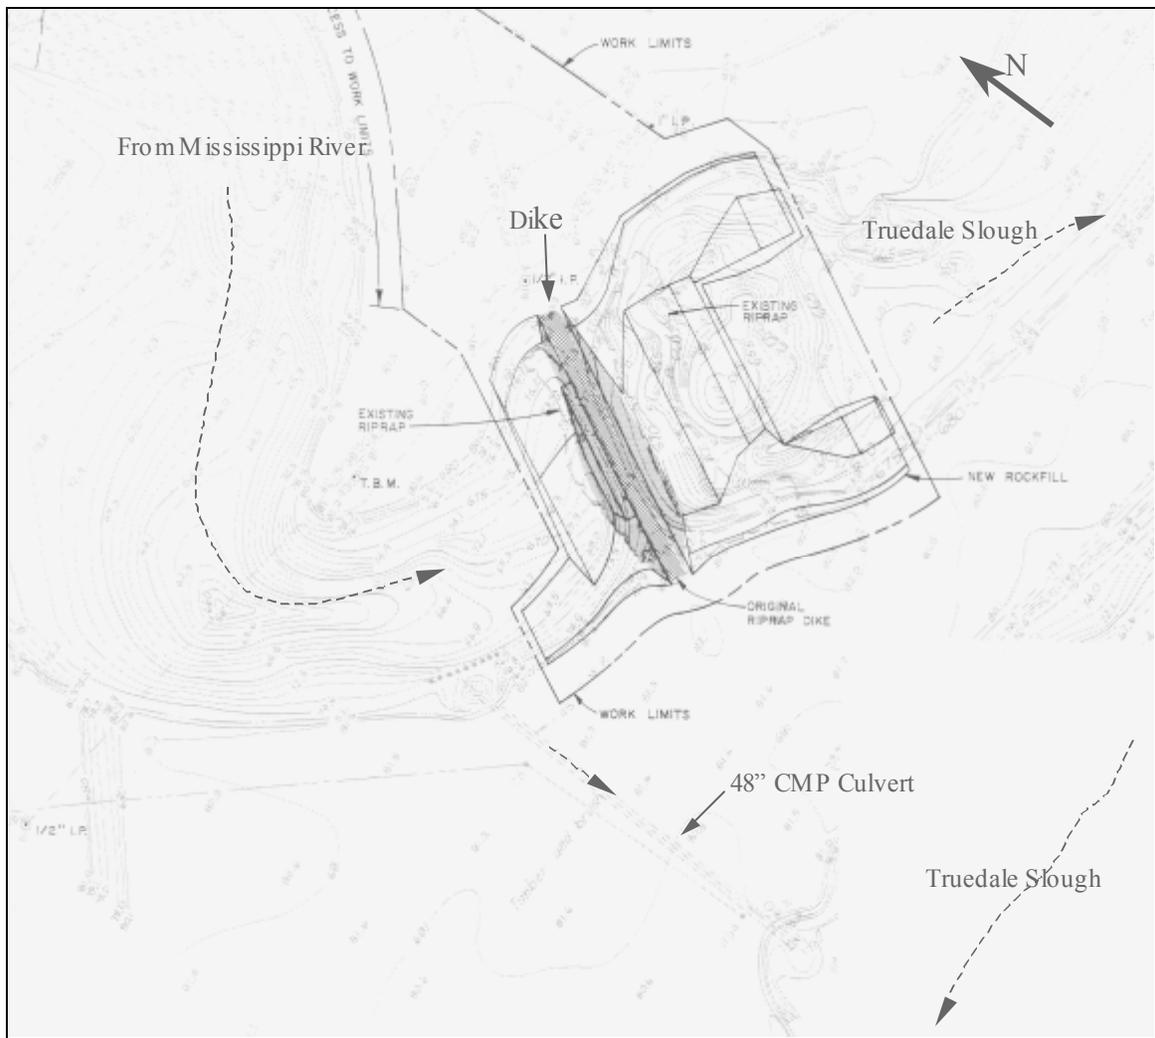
Plan View of Truedale Slough Dike and Culvert
